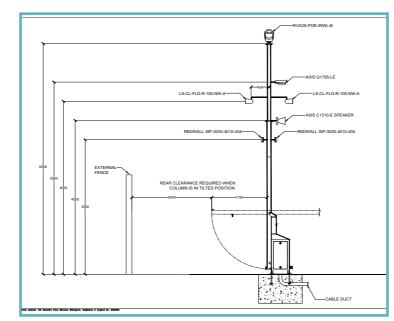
Typical CCTV installation at an OnSS compound (source: National Grid)
